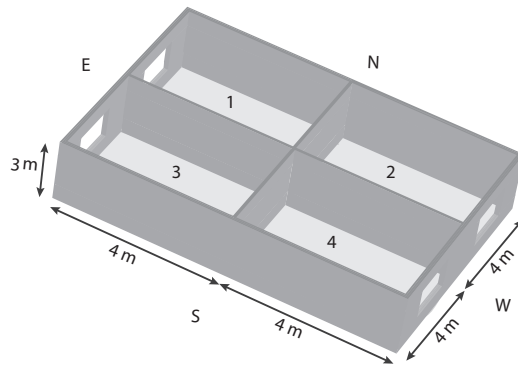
Floor plan of a 2-by-2 setup of rooms, which are modeled using the Modelica Buildings Library. Each room has a floor size of 4×4 [m], and has one window.
